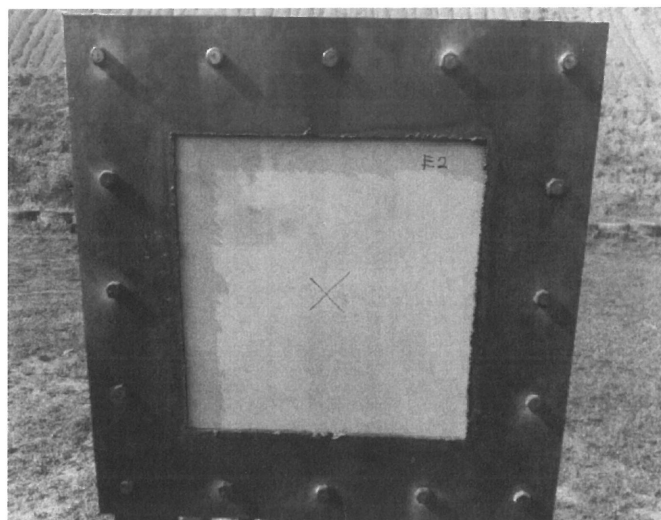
No damage to gypsum board protecting steel plate (Case 2)
